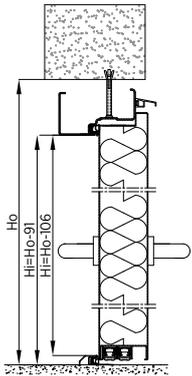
Installation of the ECO Tech single-leaf seamless door with an internal frame without a thermal break to a masonry wall - vertical cross-section
